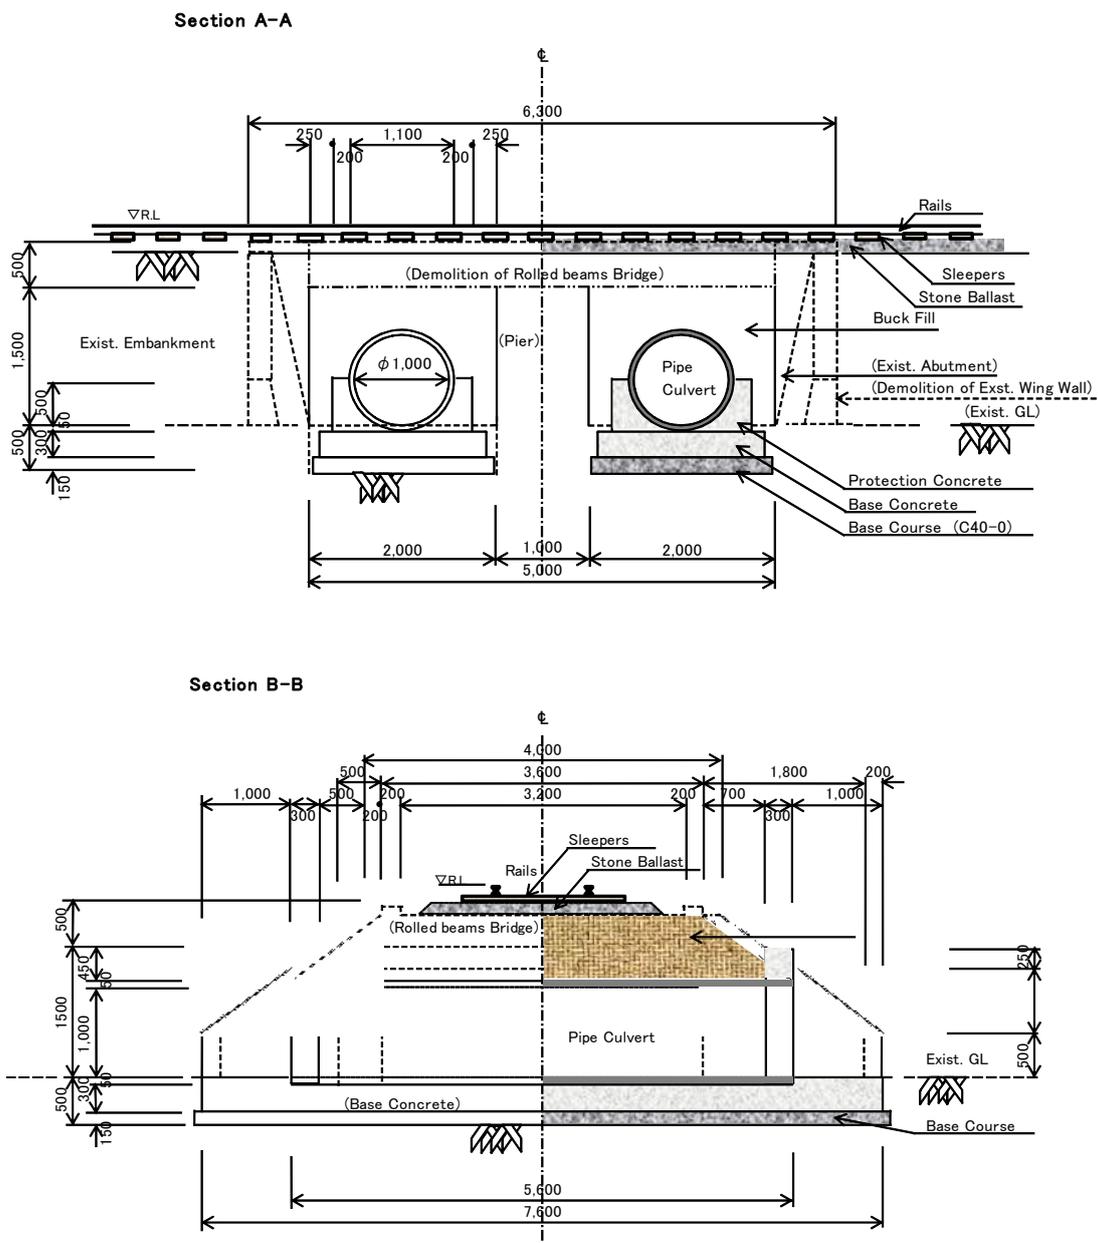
Pipe Culvert (Reconstruction Plan, 1/2)
